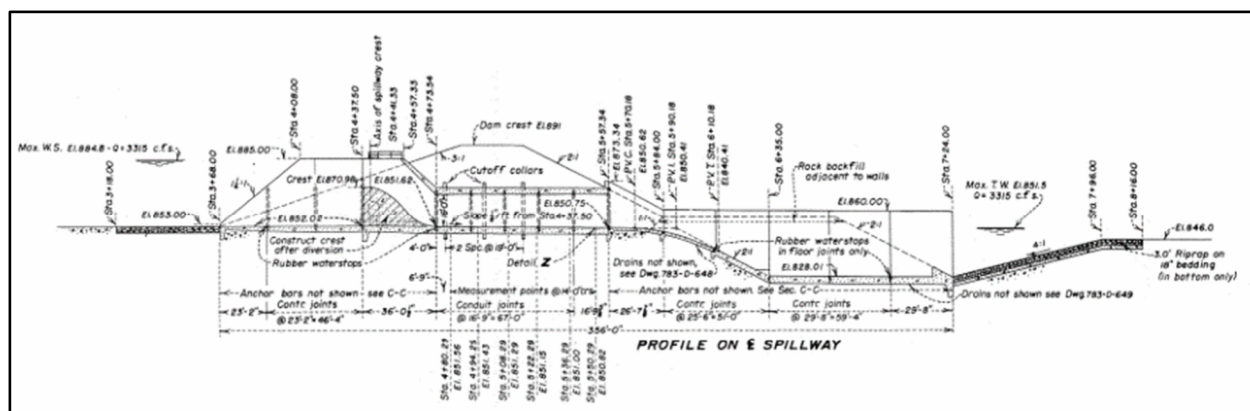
Cross Sectional View of Eklutna Dam Spillway.
